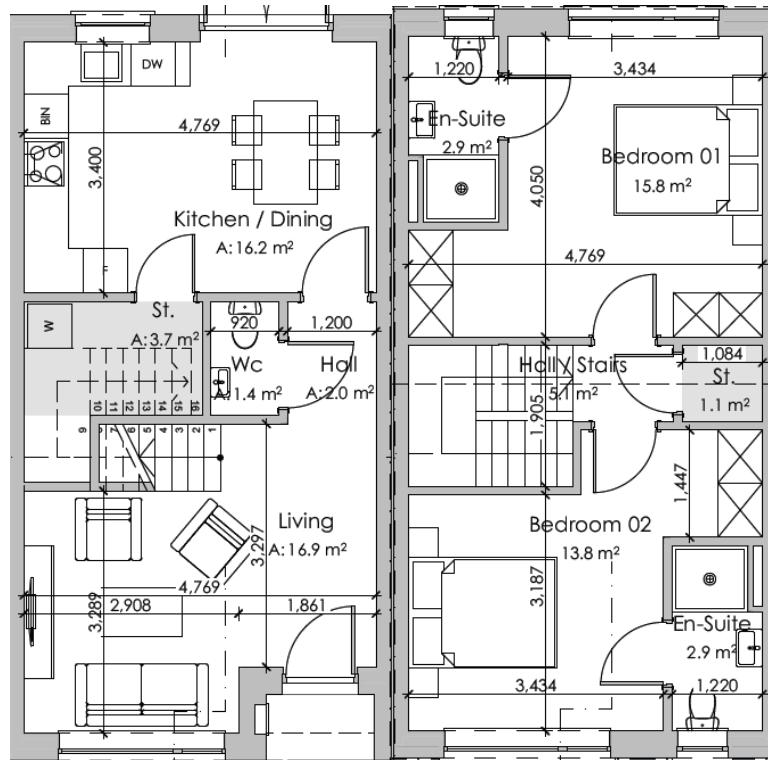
Ground (l) and first (r) floor plans of House Type 2.1
